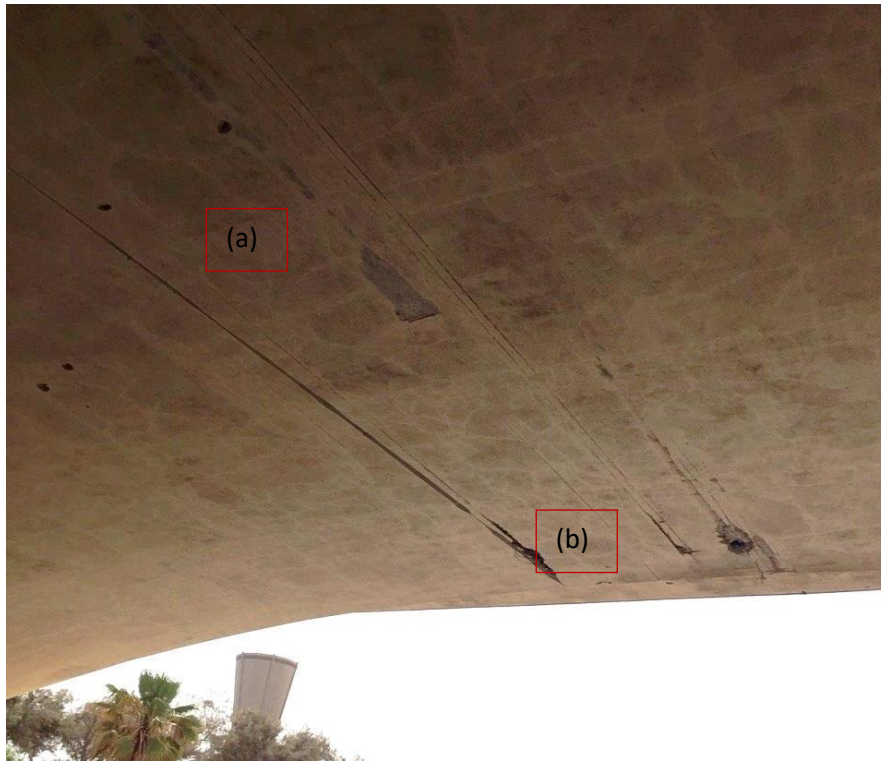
Local shallow (a) and deep (b) spalling off of repair mortar, bridge deck ceiling slab
